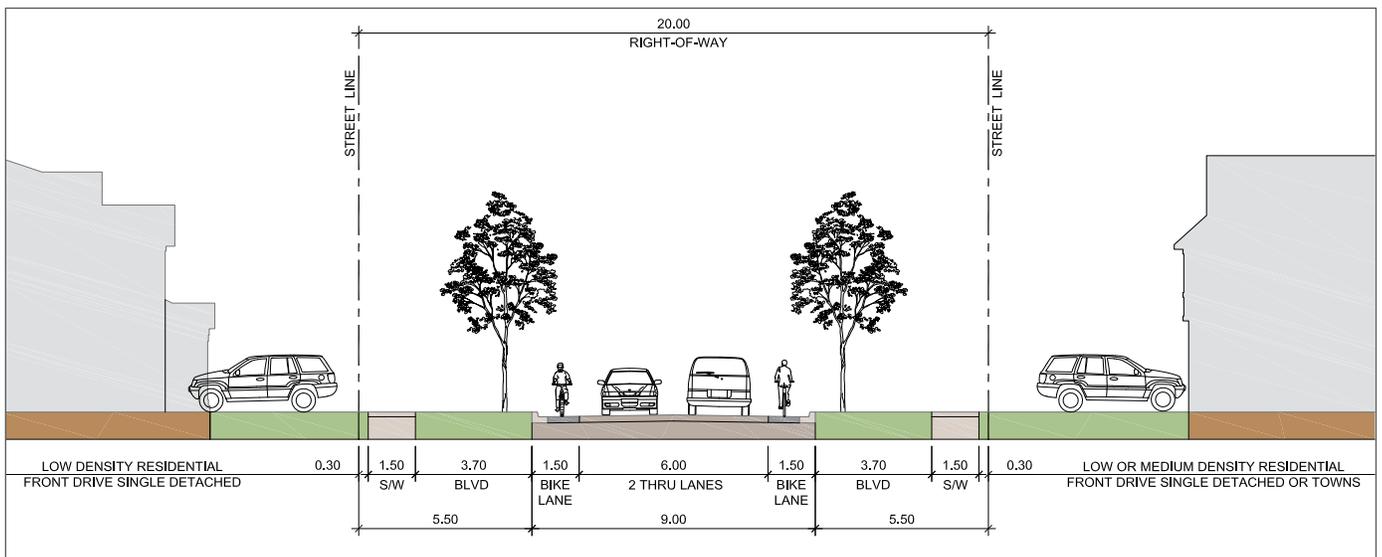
Local Road with Bike Lanes - 20.0m R.O.W. Cross-section
